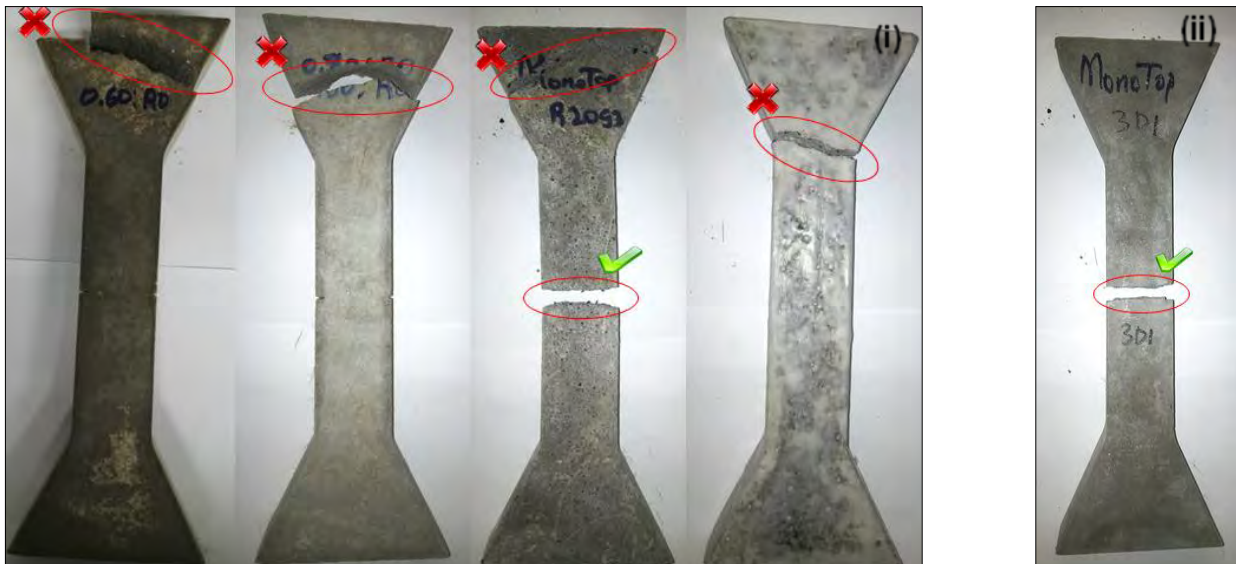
Failure modes on notched dog bone shaped specimens under tensile strength testing.
